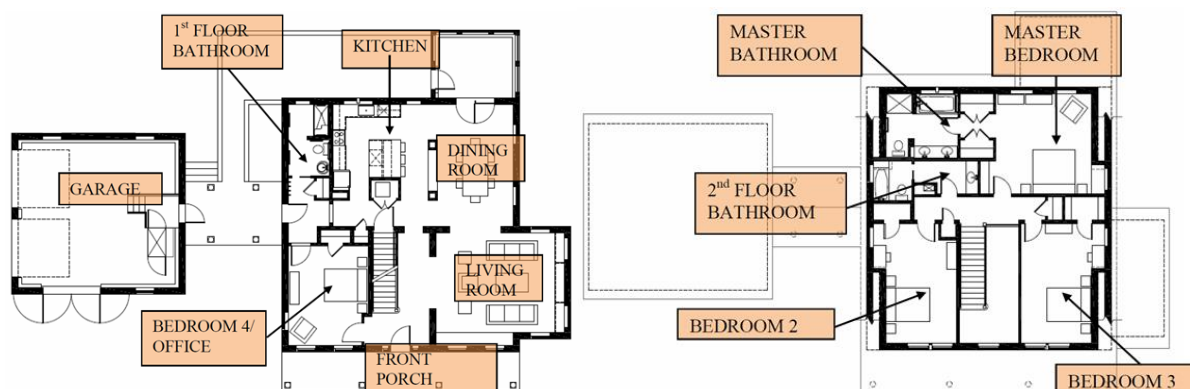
Floor plan of the Net Zero Energy Residential Testing Facility (NZERTF), first floor and garage (left) and second floor (right)
